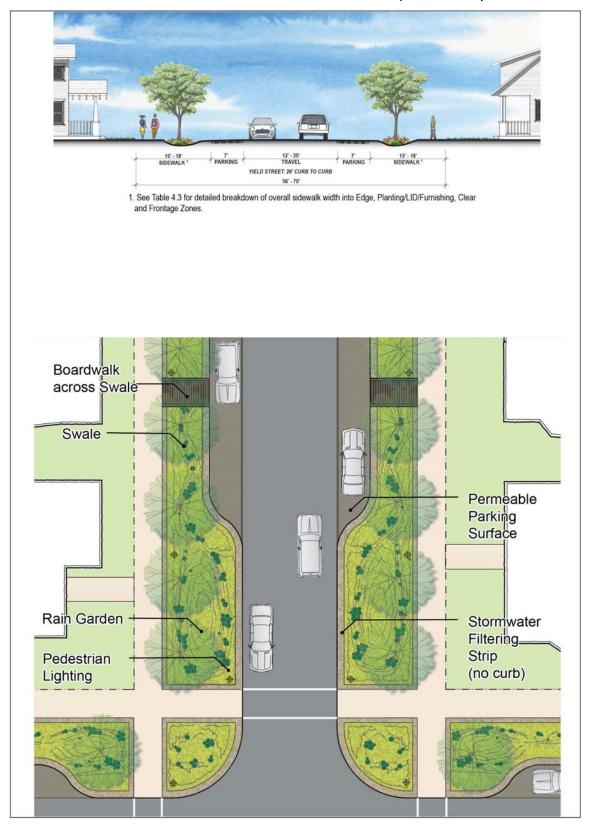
B STANDARD RESIDENTIAL STREET – ALTERNATIVE 2 (WITH CURB/NARROW LID)
